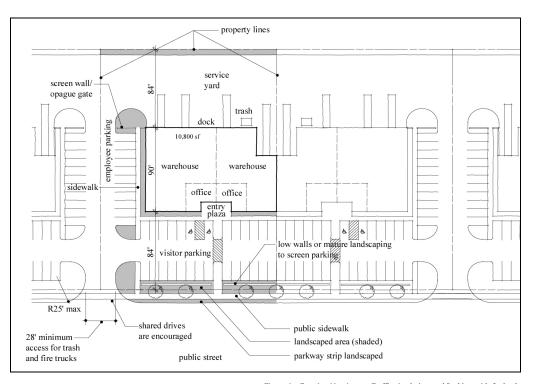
Zero Lot Line Layout Traffic circulation and Parking with Setbacks
